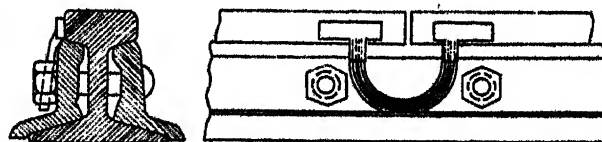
WELDED CONNECTION TO HEAD OF RAILS
